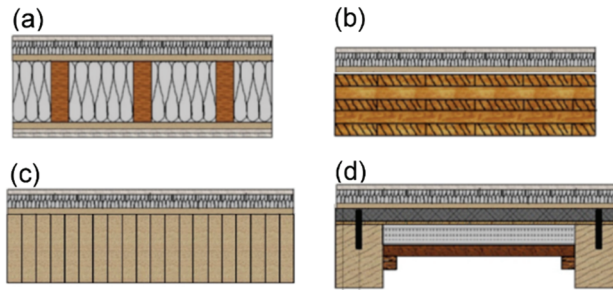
Timber floor types: (a) Timber floor panels; (b) Cross-laminated timber floor; (c) Glued laminated timber floor; (d) Timber-concrete composite floor
